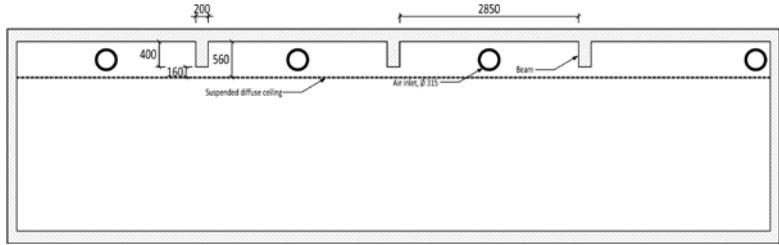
Longitudinal section of the experimental room showing plenum segments and dimensions of the dividing beams.
